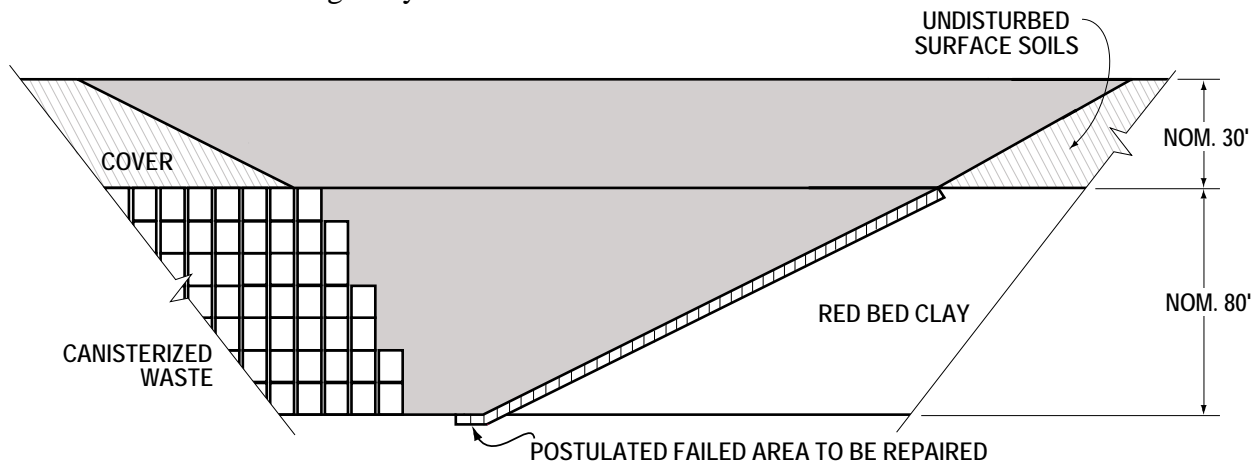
Depiction of Excavation Required to Repair Postulated Failed Area on Side Slope of FWF-CDU
